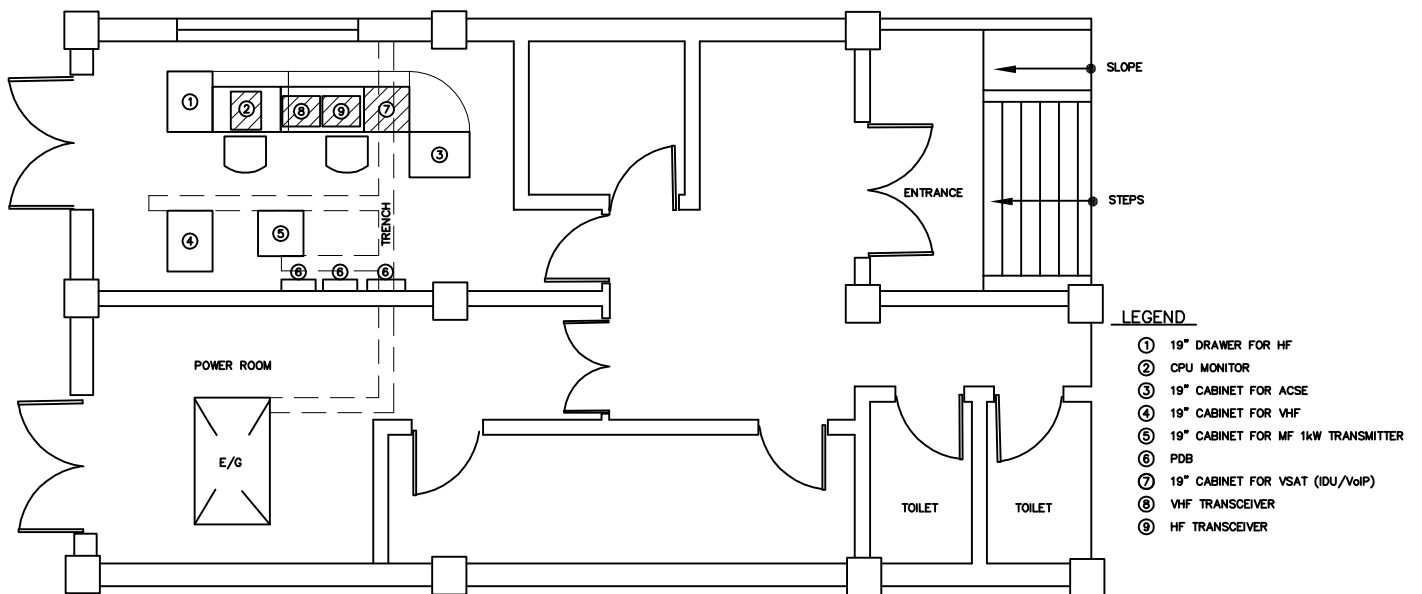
EQUIPMENT LAYOUT PLAN FOR H2CGD CEBU
